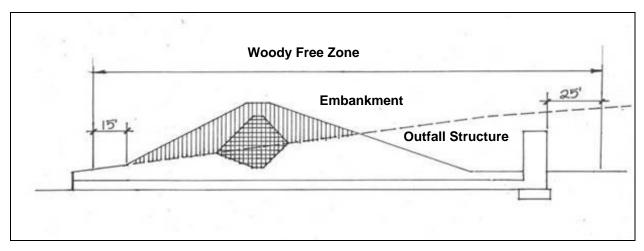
Pond Code 378 Woody Planting Restrictions at SWM Embankment (from VEQ-S Reviewer Guidelines)
